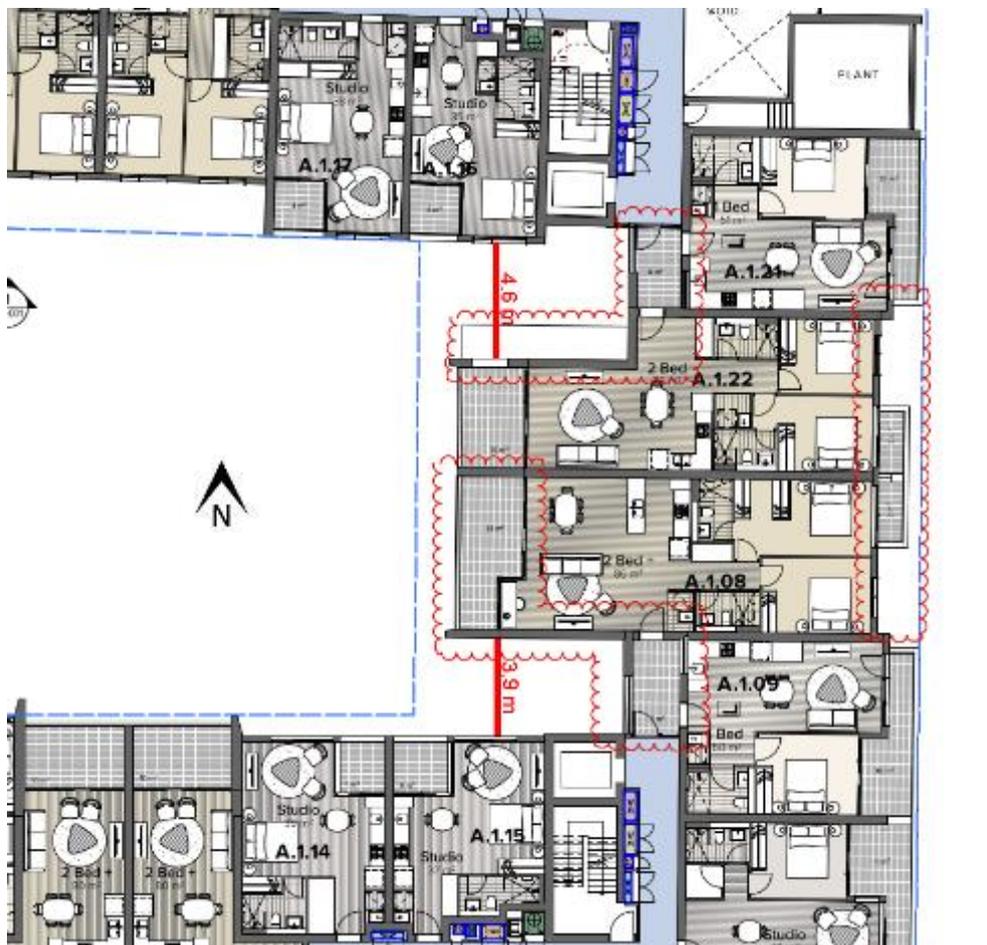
Extract from the level 1 plan, illustrating the separation distances between the studio apartments and blank walls opposite.
